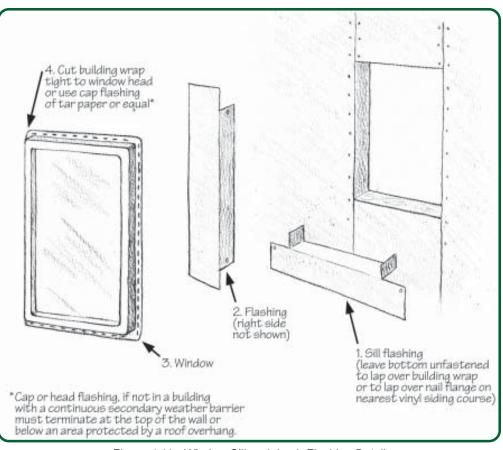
Window Sill and Jamb Flashing Detail (building wrap installed after window)
